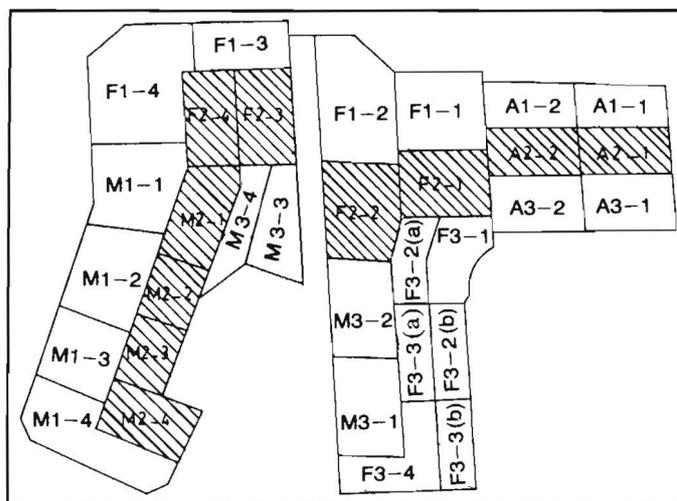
Plan Lay Out of Al-Samra Treatment Plant.
